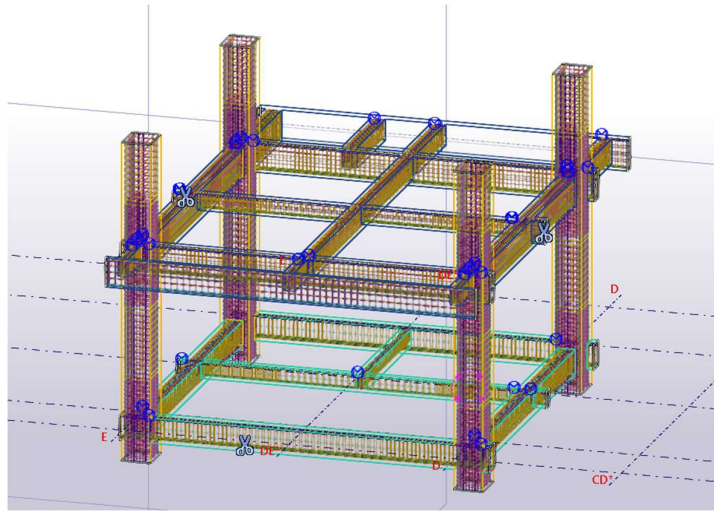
12 Reinforcement Model of the Beams and Sloofs
